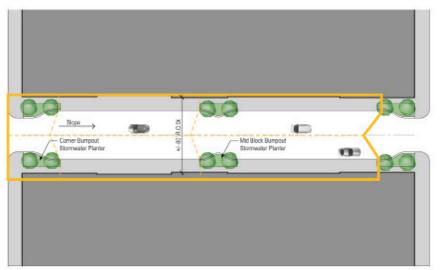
Bumpout Stormwater Planter City Block Diagram (Source: Stream Design. 2015.)
